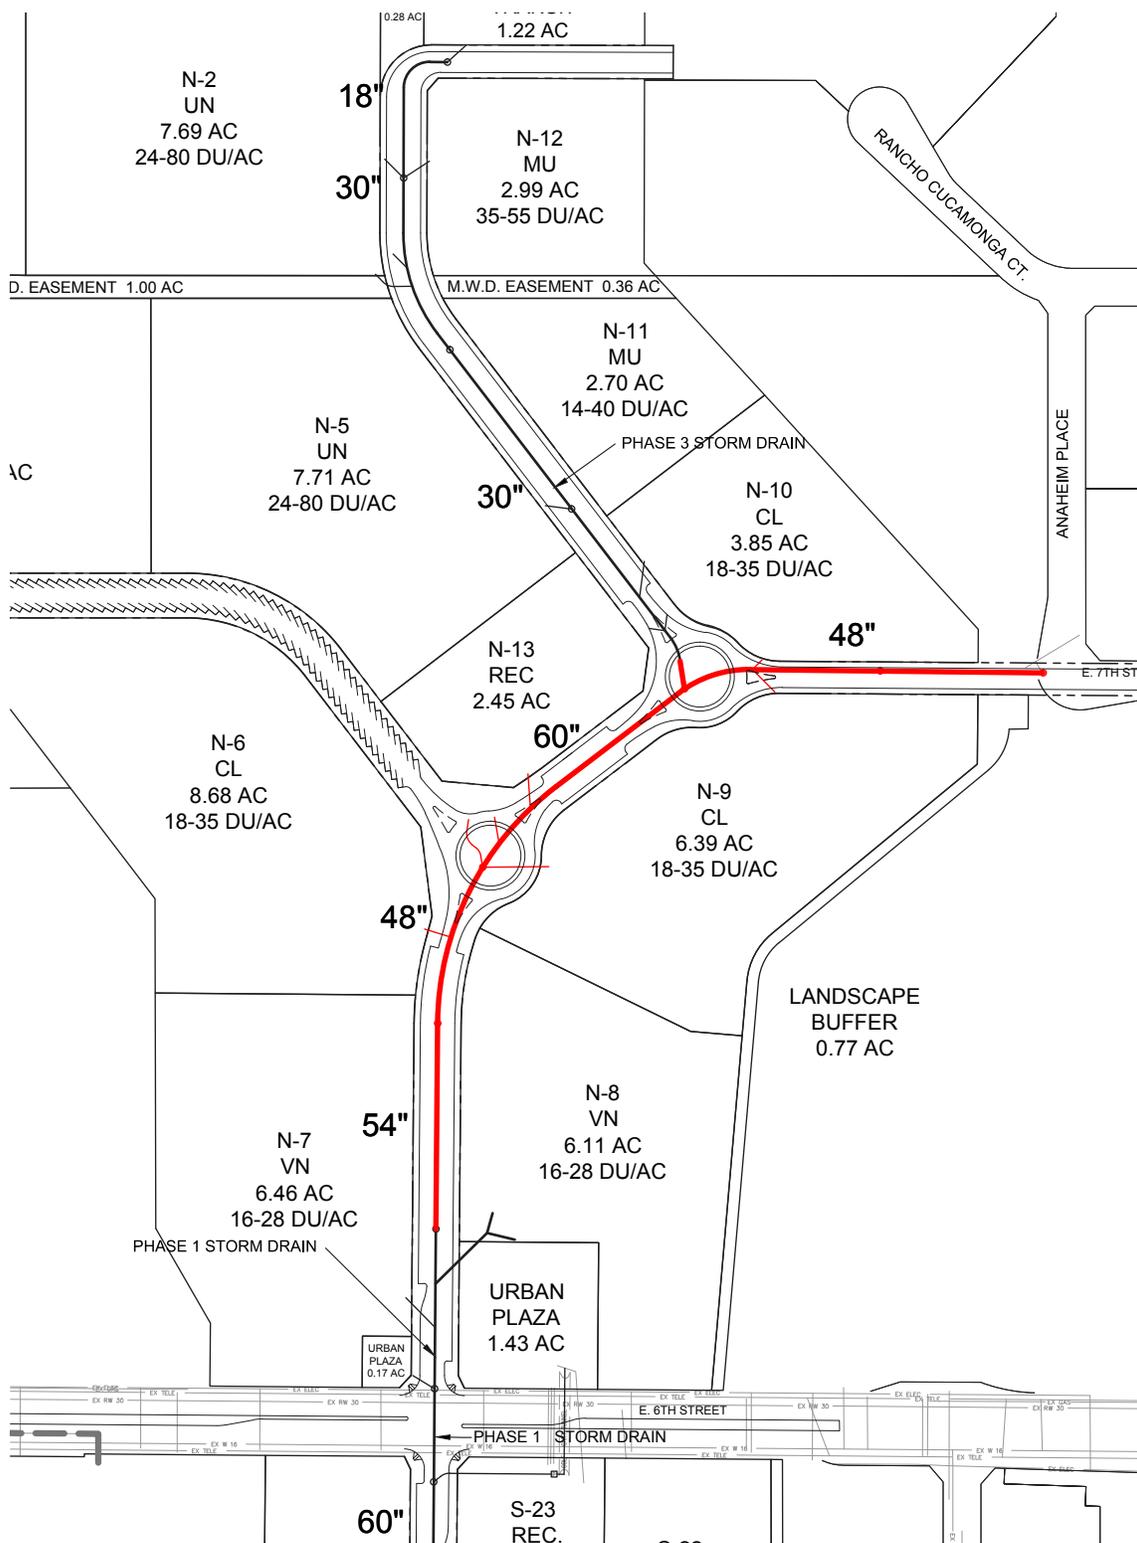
Conceptual Phase 1 Interim Grading Storm Drain Facilities Plan
